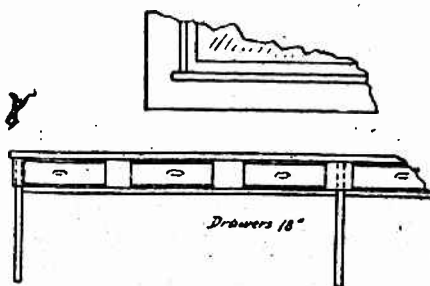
Elevation of blackboard and drawers for supplies. Racks for drawing boards could be substituted for two rows of drawers. The blackboard should be of slate.
